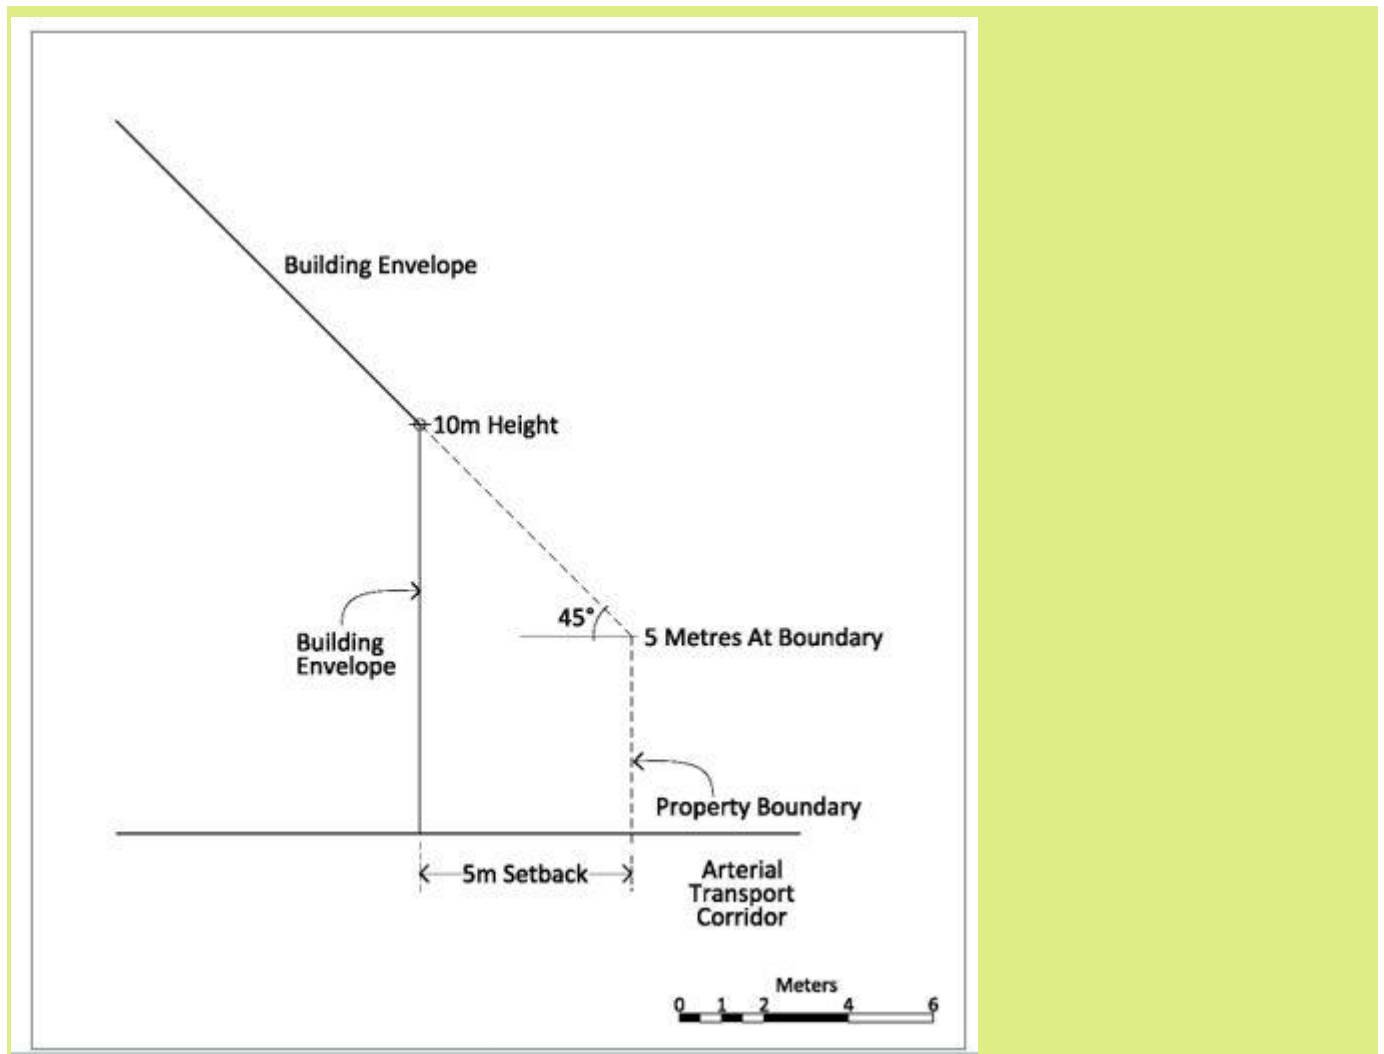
Building envelope for buildings located on an Arterial Transport Corridor
